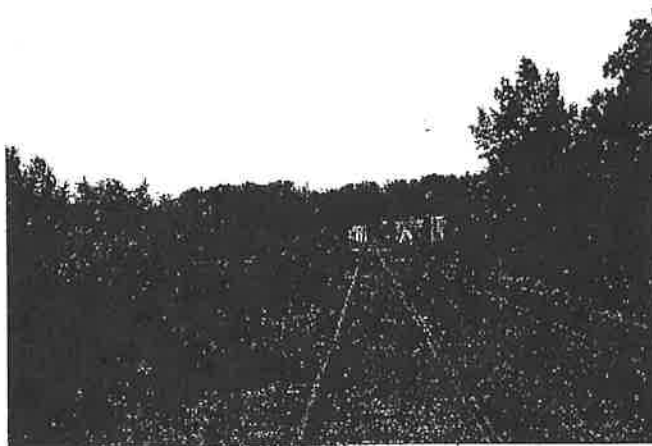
Looking Southerly along railway from proposed location of Fourteenth Street connection, Phase Two.
